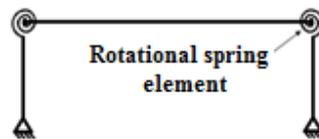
Schematic of semi rigid connection of one-bay one-story steel frame
